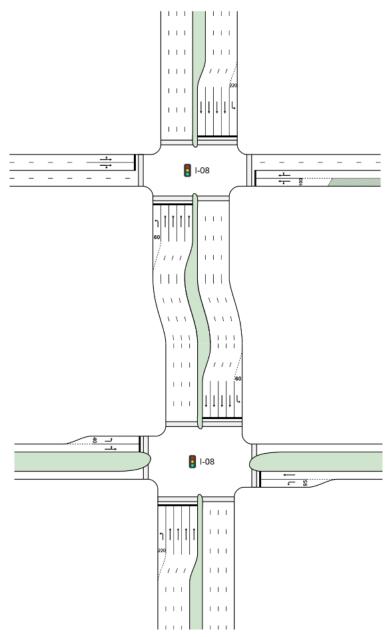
G-turn and light rail upgrades required for Silverwater Road/Carnarvon Street intersection
